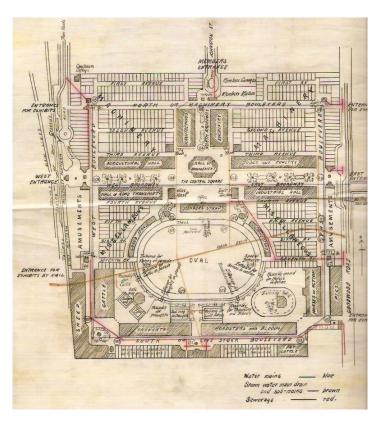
Plan showing Heath's Layout for the Wayville Showground
